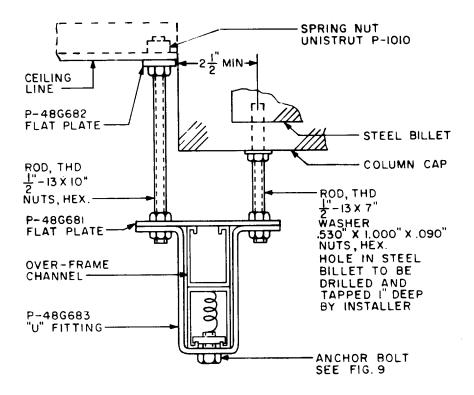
Fastening Overframe Channel to Ceiling and Column Cap (A&M Only)
